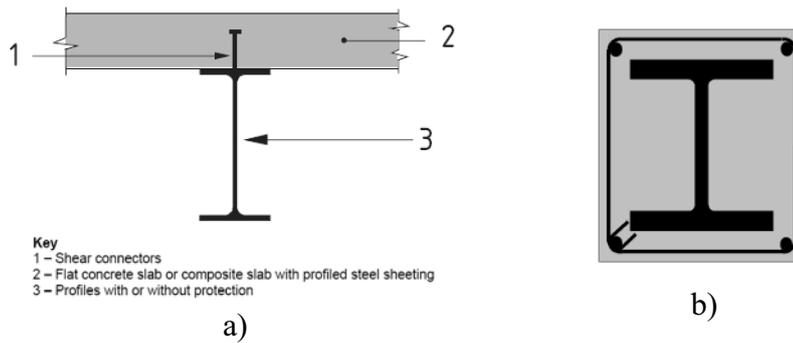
a) Composite beam comprising steel beam with no concrete encasement
